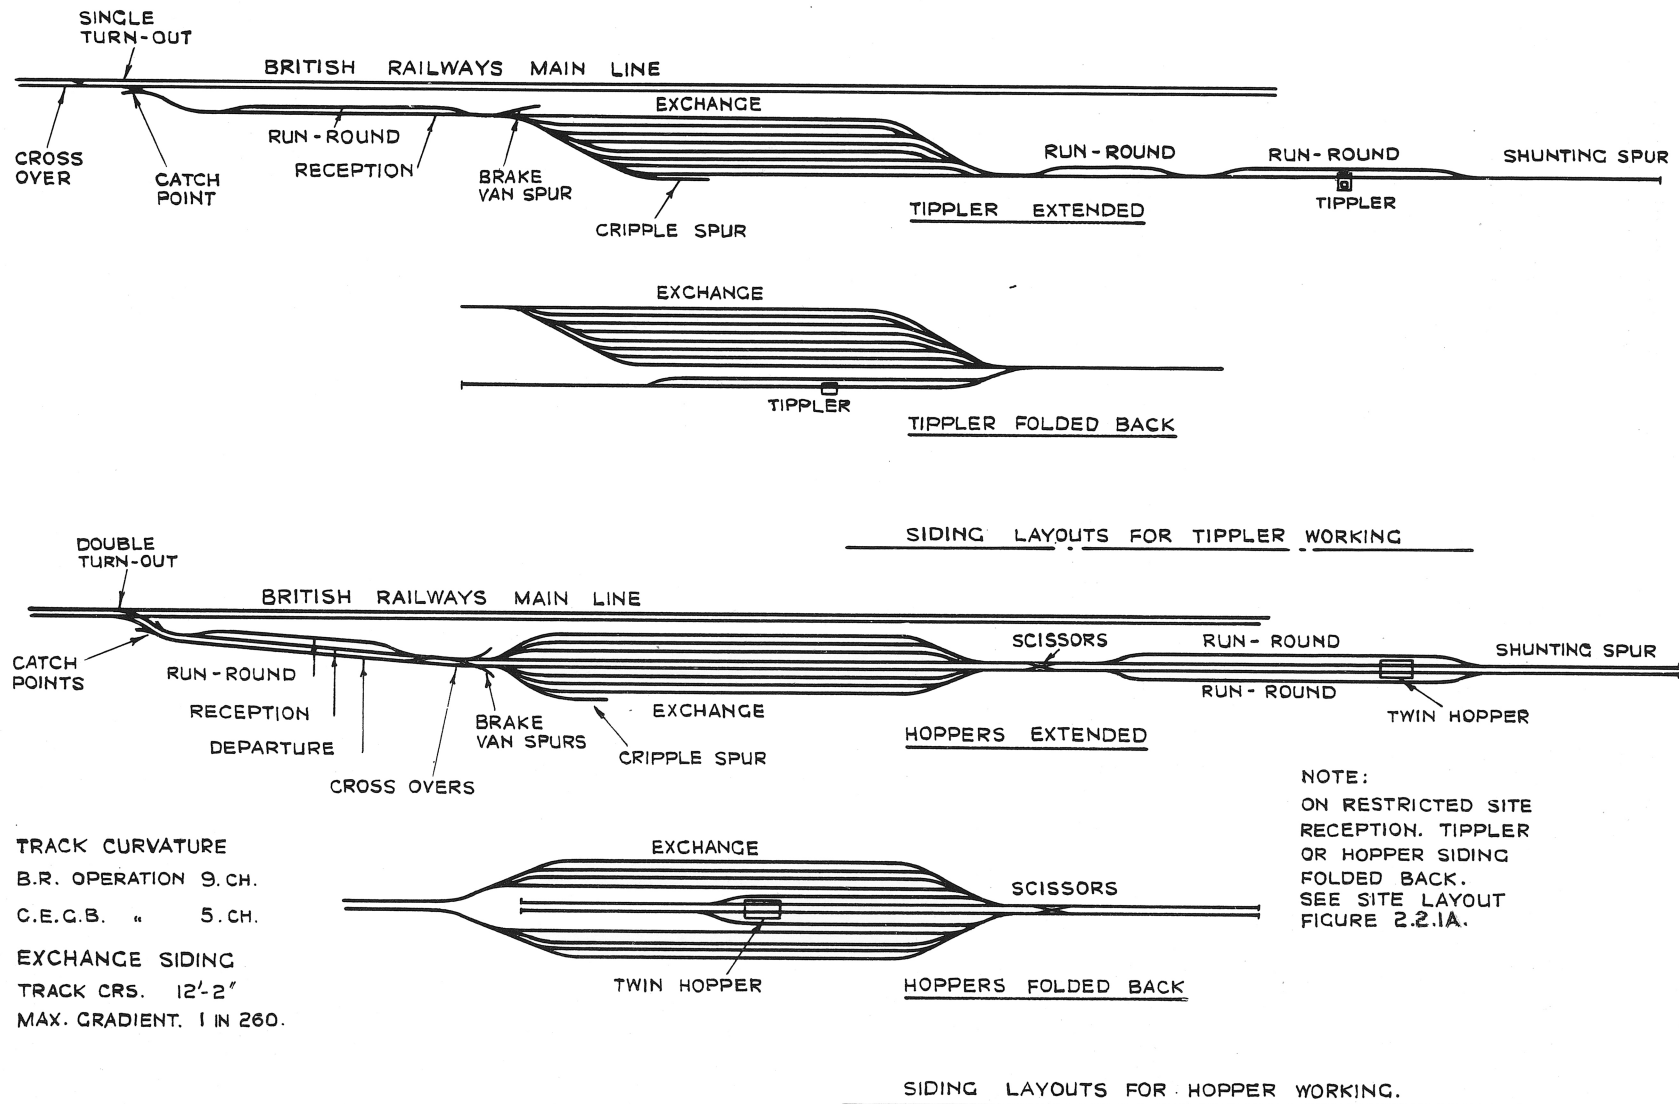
TYPICAL SCHEMATIC SIDING LAYOUTS
